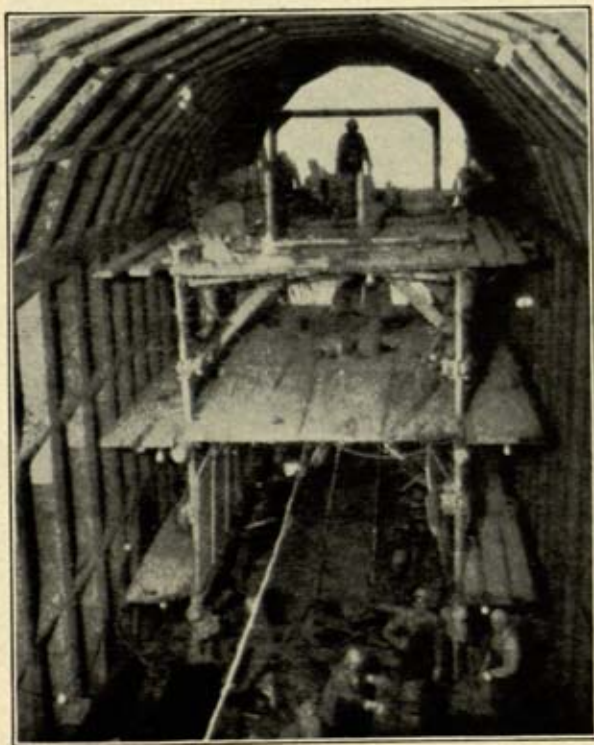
Wood timbering used to support the walls and roof of a tunnel. (*Union Pacific Railroad.*)
